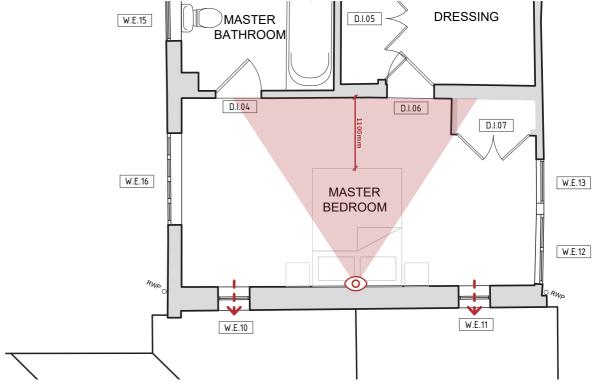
First floor bedroom - limited overlooking over the landscape in the existing layout
